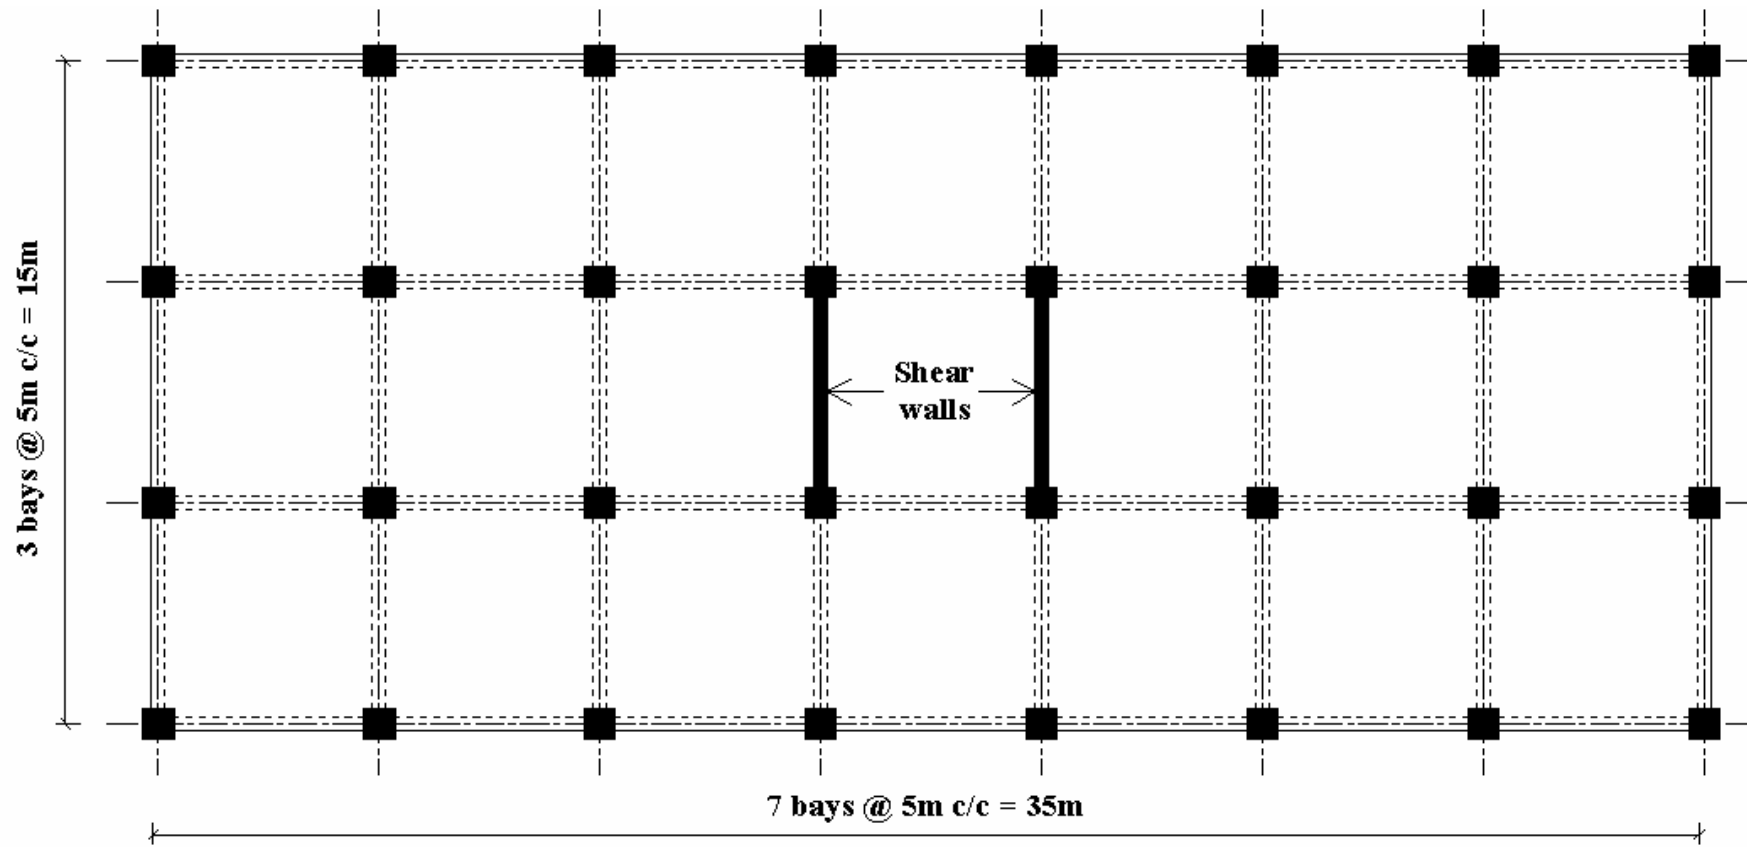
Typical floor plan for 6- and 12-story buildings with frame-shear wall structures
